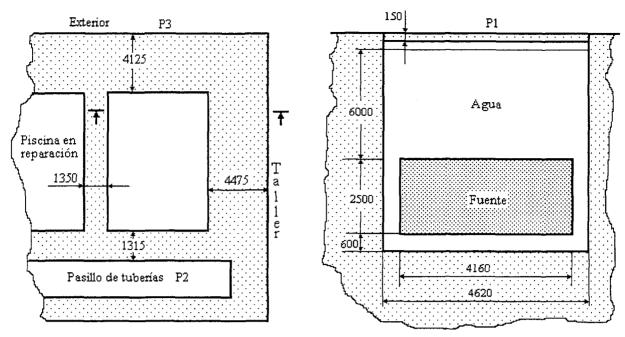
Layout of the spent fuel storage pool. Plant view (left), section (right)
